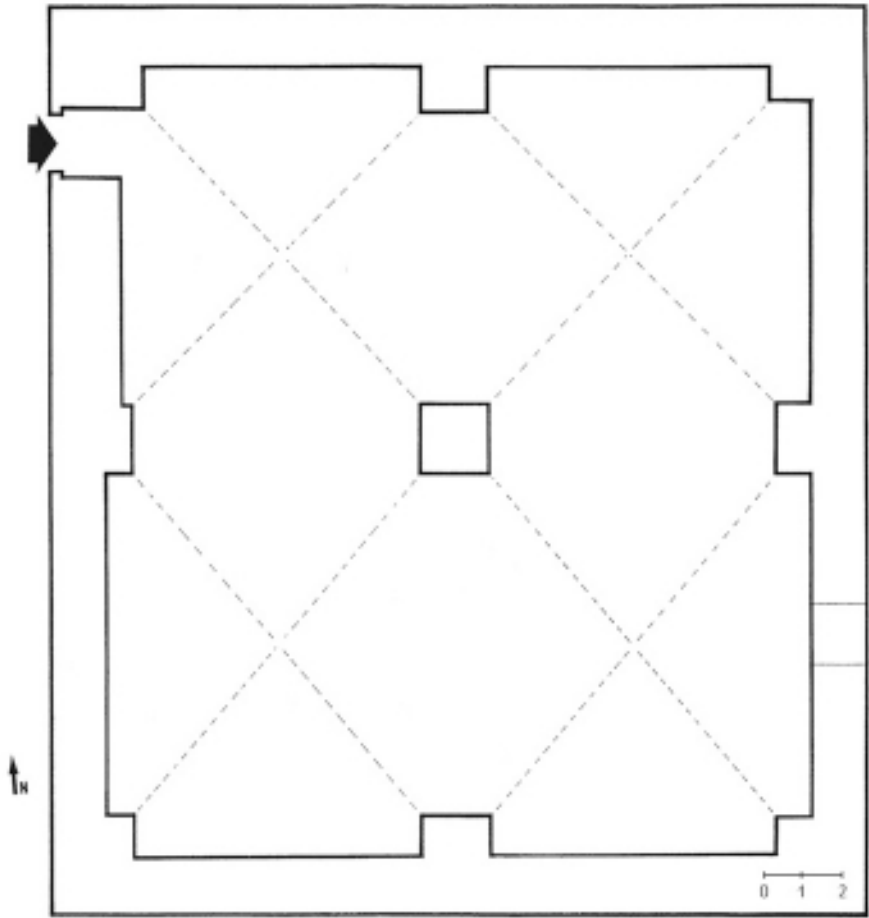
Plan of ground floor of palace in Pisan quarter, Acre (House 1:10) (drawing by author).
